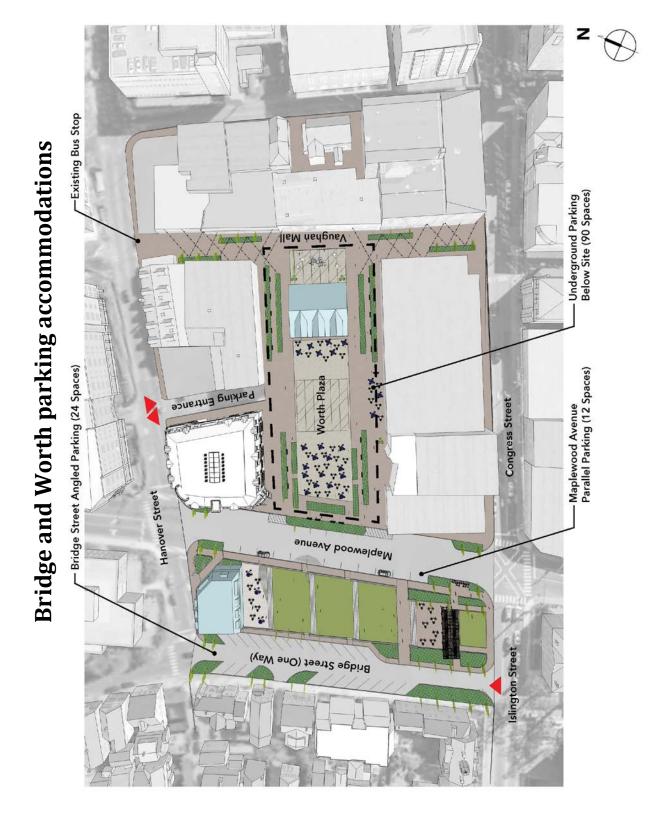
The vision provides parking accommodations for local businesses in the context of a larger Portsmouth parking plan. The plan envisions underground parking beneath the Worth lot open space to and from Hanover Street, on-street parallel parking on Maplewood Avenue and angled parking on Bridge Street for a total of 126 spaces.
